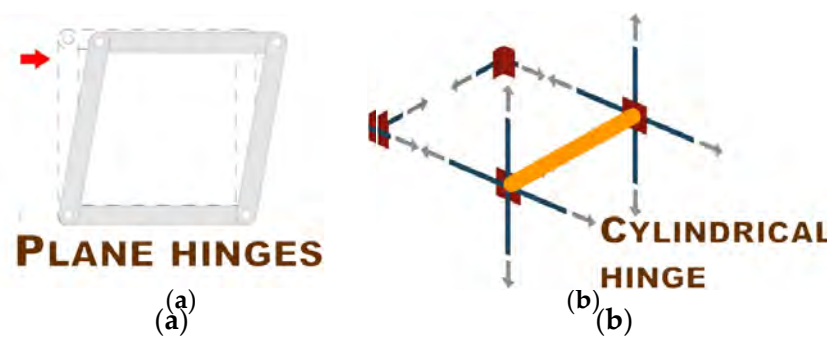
Liability of the CAM® system with a rectangular arrangement: (a) in the wall plane, according to the simplified mechanical model of the unbraced rectangular frame structure with hinged nodes; (b) cylindrical hinge (without the masonry masonry blocks, a proper three-dimensional arrangement of the straps).
